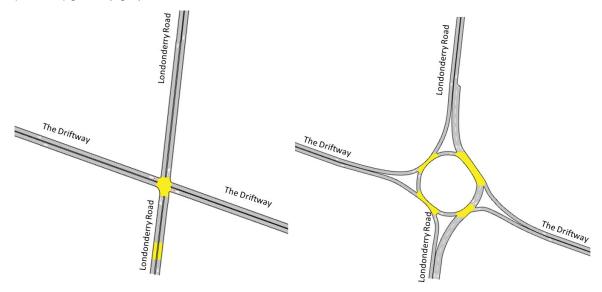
Londonderry Road and The Driftway intersection (Location 1) – Existing layout (left) and proposed upgrade (right)
